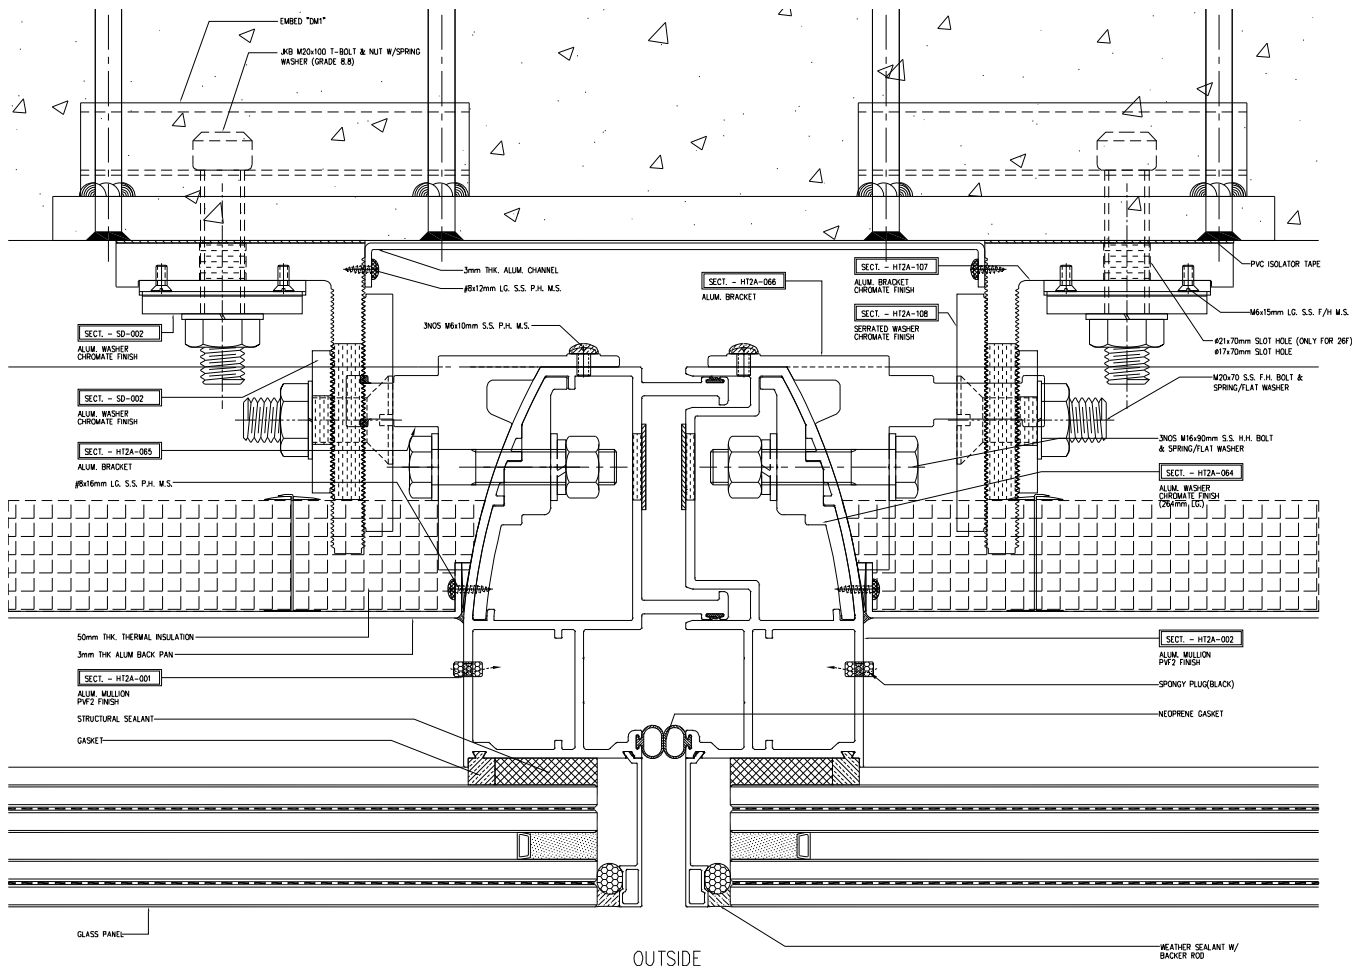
Curtain wall detail, at mullions. © Wong & Ouyang Architects
